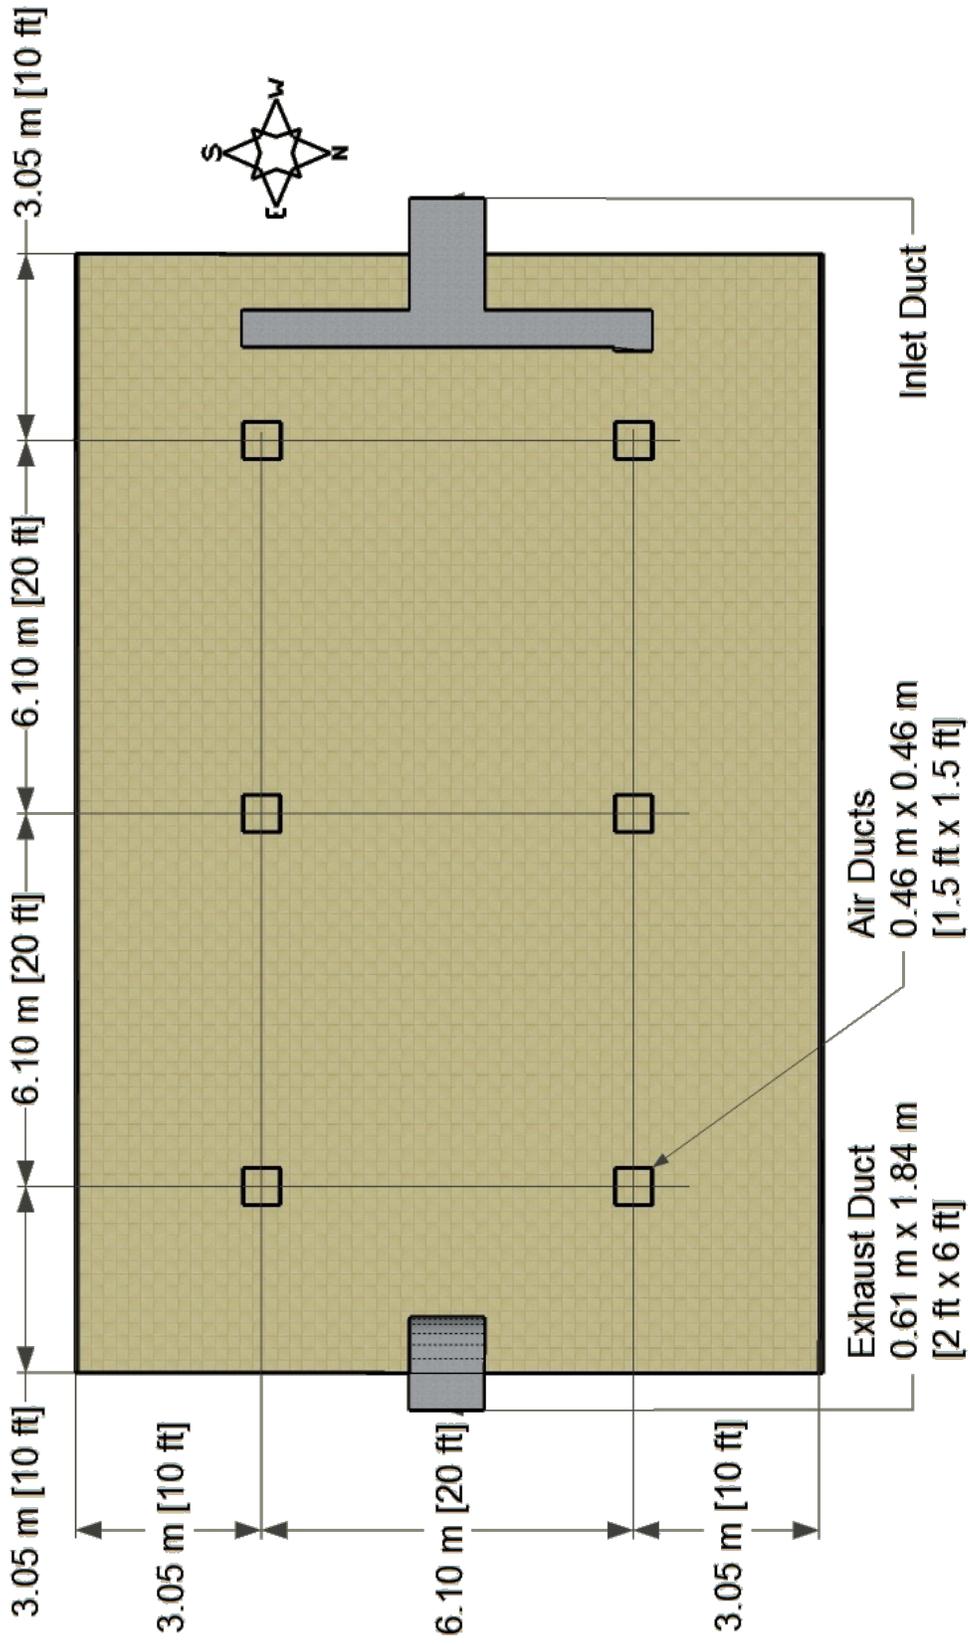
Plan View of Test Enclosure and Location of Air Ducts
